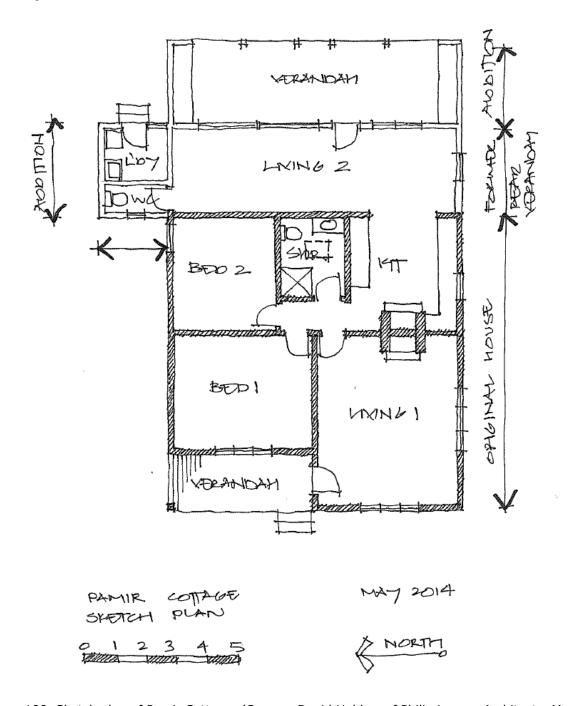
Sketch plan of Pamir Cottage. (Source: David Hobbes of Philip Leeson Architects, May 2014)
